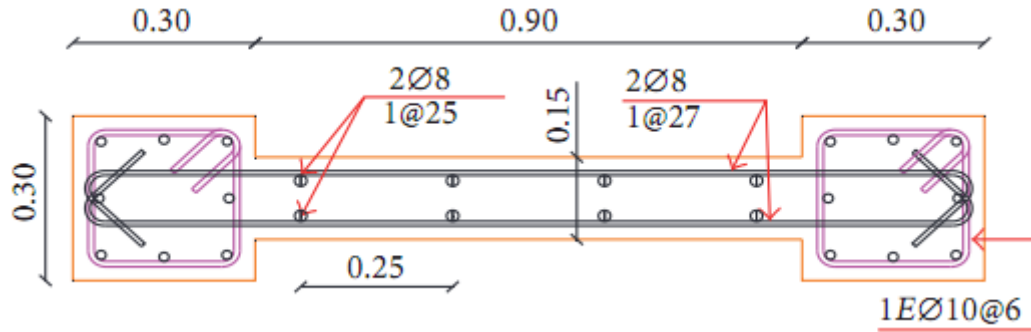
Specimen detailing of (Sosa, et al., 2017).
